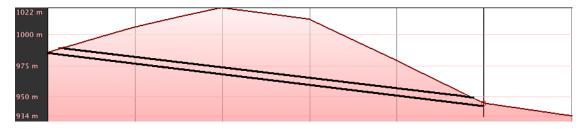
Elevation profile of proposed spillway tunnel [12]
